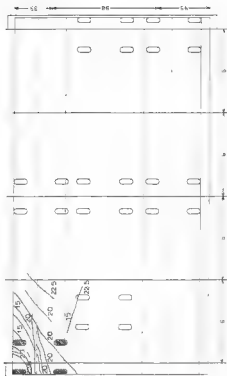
Top Cracking Pattern (Fifth Bridge - Test No 4)
